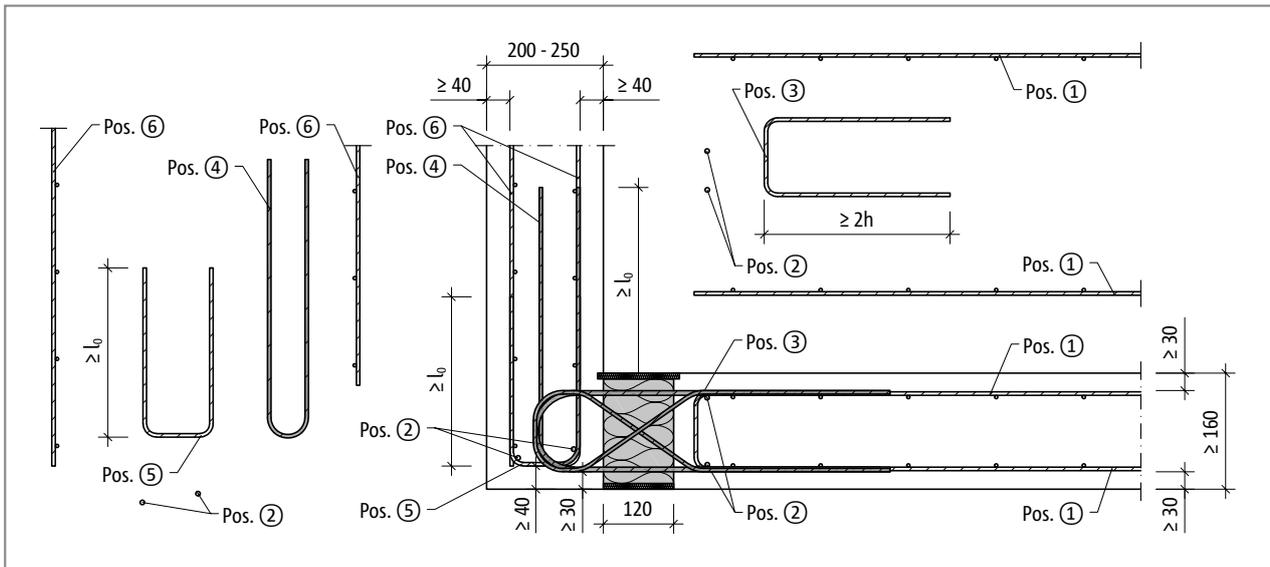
Schöck Isokorb® XT type F: On-site reinforcement with parapet/balustrade width $b = 200 - 250$; on-site reinforcement $b = 160 - 190$ such as $b = 200 - 250$ without Pos. 5
